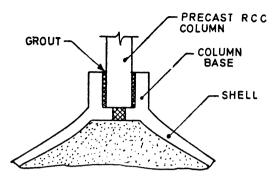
SOCKET CONNECTION FOR R C COLUMN WITH PRECAST HYPAR FOOTING
